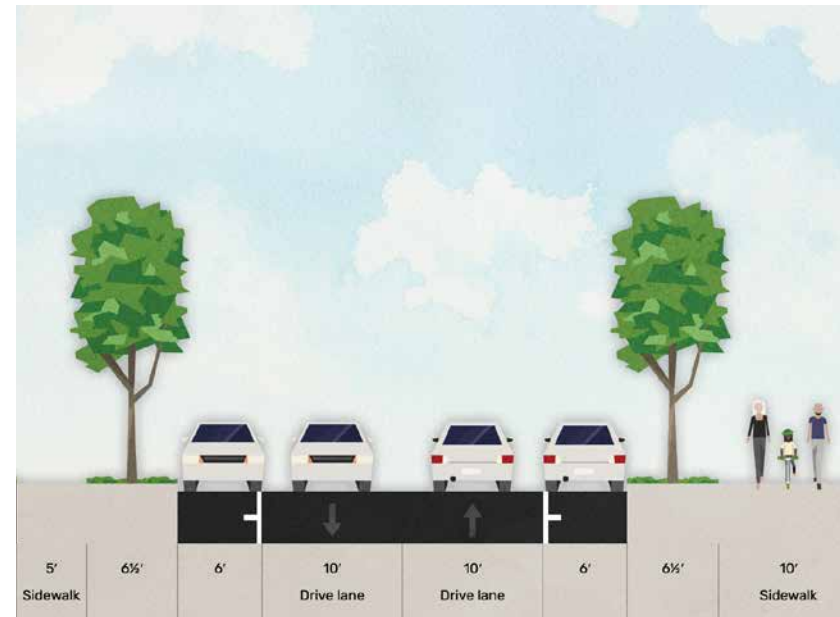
Recommended configuration for narrow streets, showing with a sidewalk on one side.
